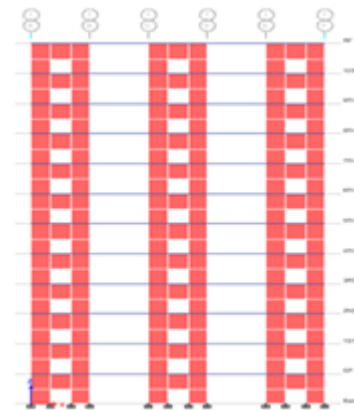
Elevation of Coupled Shear Wall Structure Model 03
